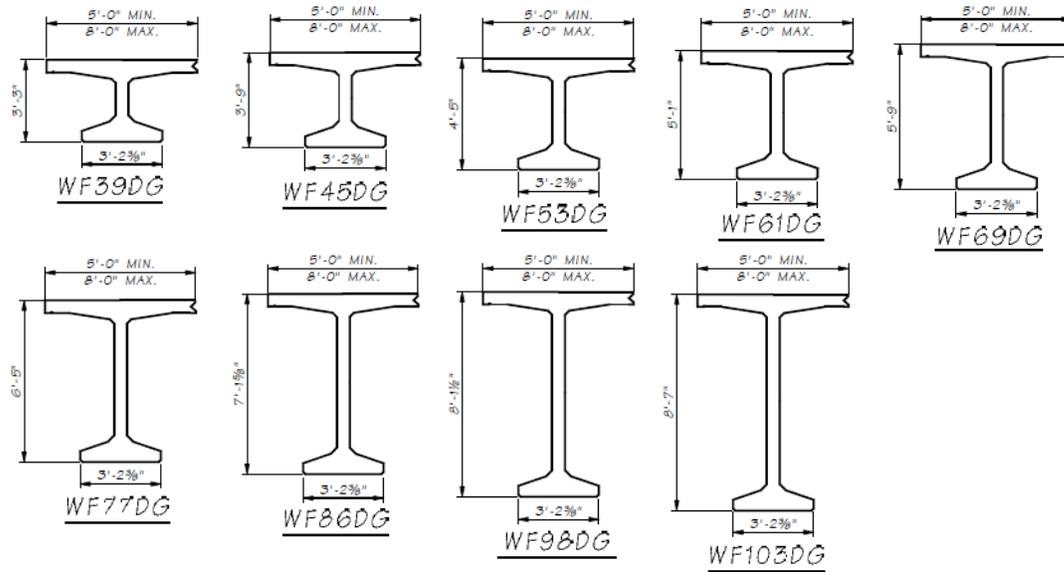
WSDOT Pretensioned Wide Flange Deck Girders.
